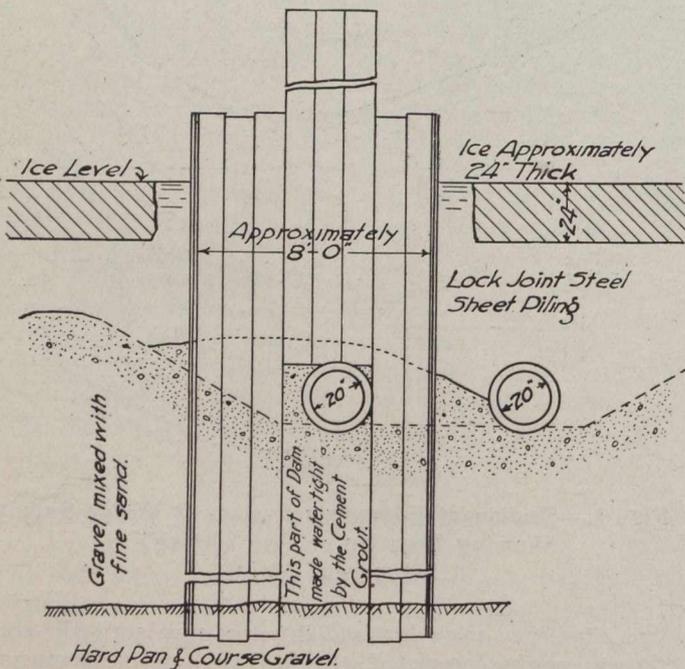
Sketch of Cofferdam Constructed Around the Section of Broken Pipe.
